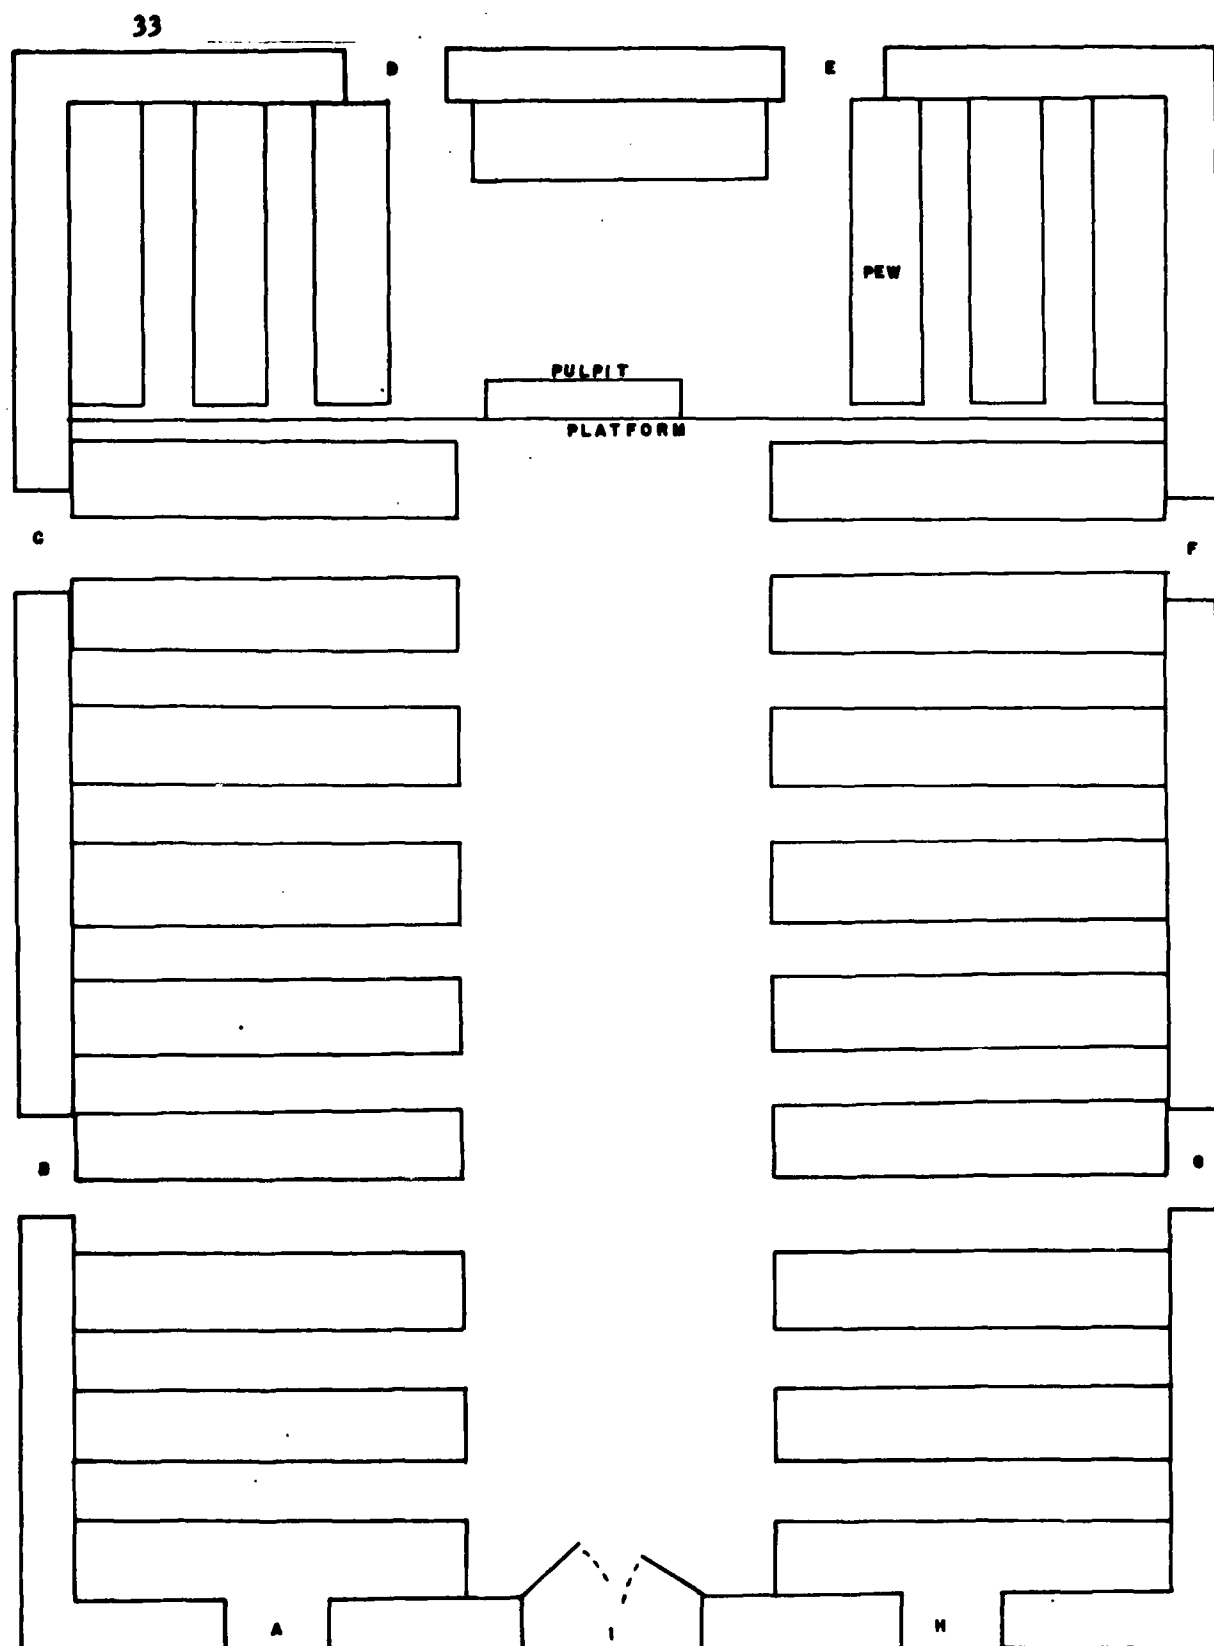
Floor plan of Fishtrap United Baptist Church on Tract 302.
